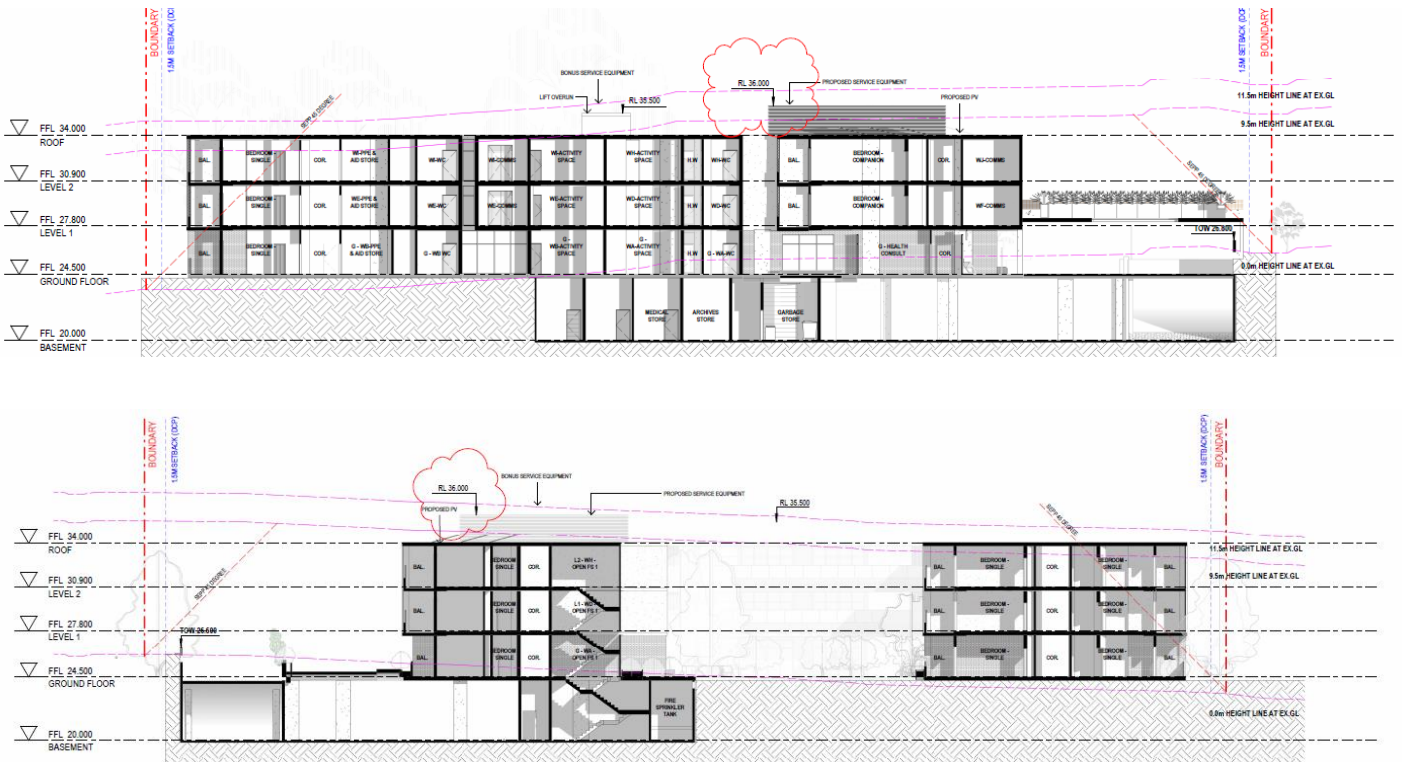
Sections illustrating 9.5m maximum building height limit and 45 degree setback control to Level 3 (eastern section top and western section bottom)
